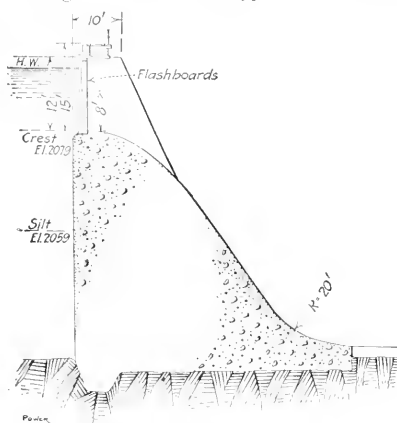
SECTION OF SPILLWAY PLANT No. 4
